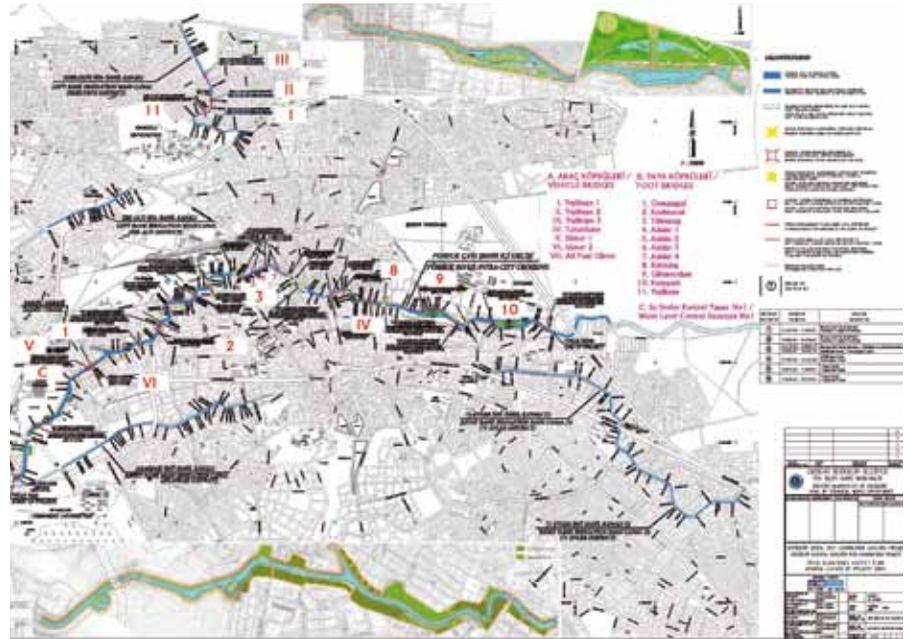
Porsuk River Project Layout Plan that Shows Vehicle Bridges, Pedestrian Bridges, and Water Level Control Structures
